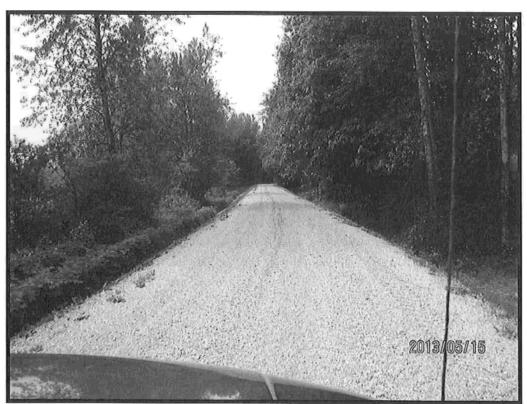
West view of Dike B near the dike and Tuyttens Road crossing (May 15, 2013)
